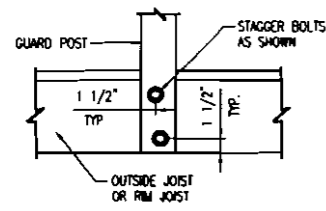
GUARD POST ATTACHMENT DETAIL
